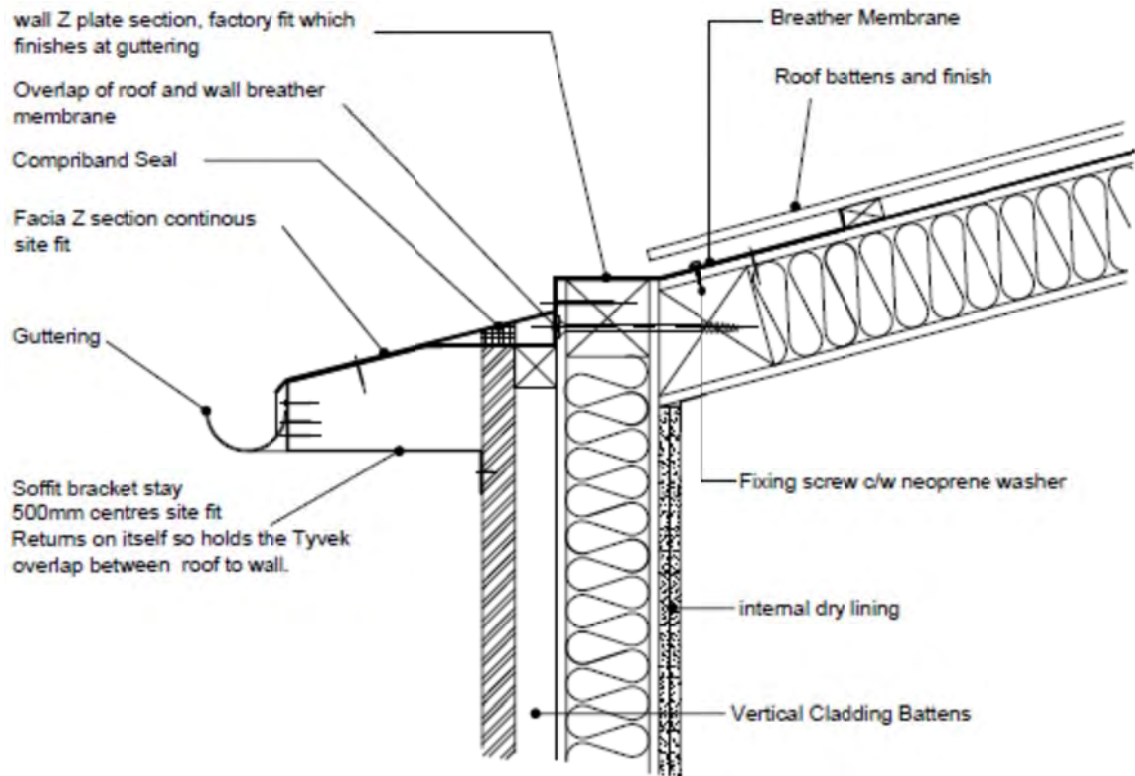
Details of connection between external wall and pitched roof (Chadwick, 2011).
